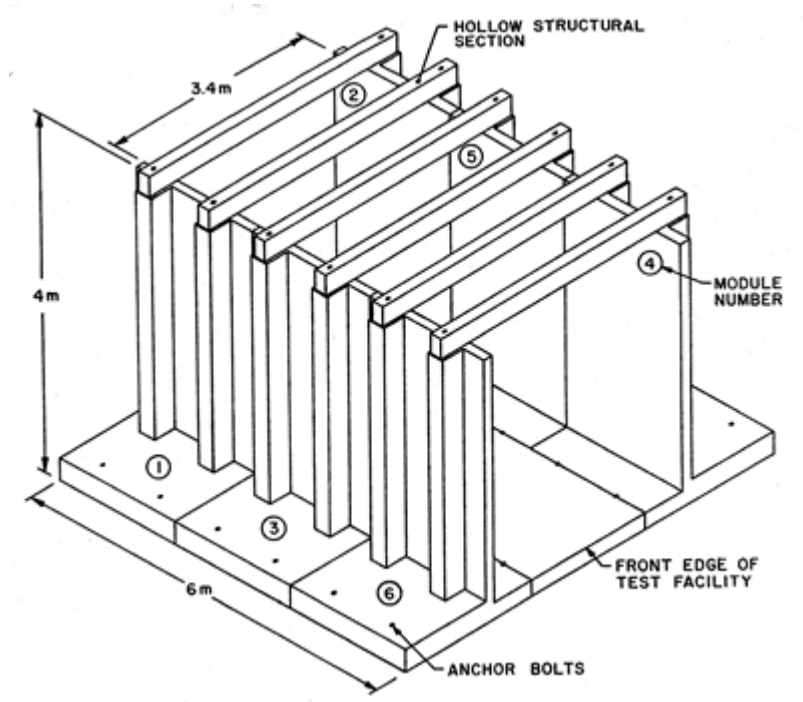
Retaining Wall Test Facility (Bathurst et al. 2000).
